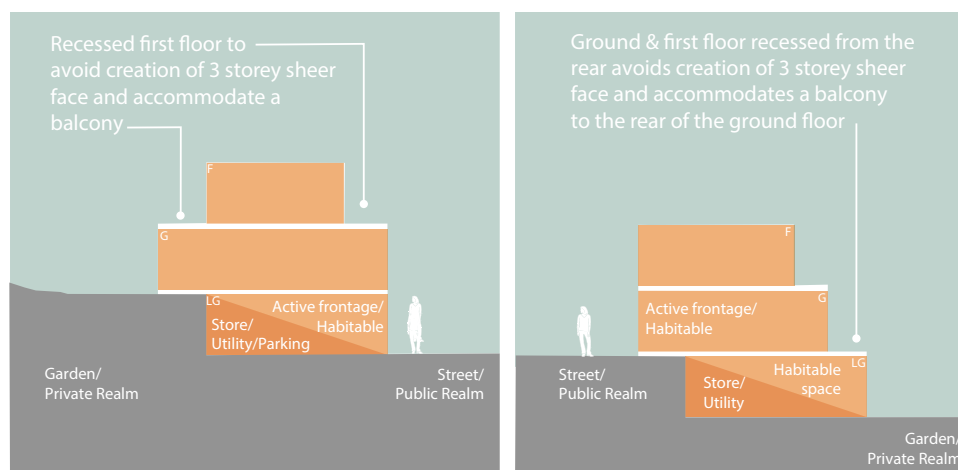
PLACEMENT OF DWELLINGS ON SLOPE
